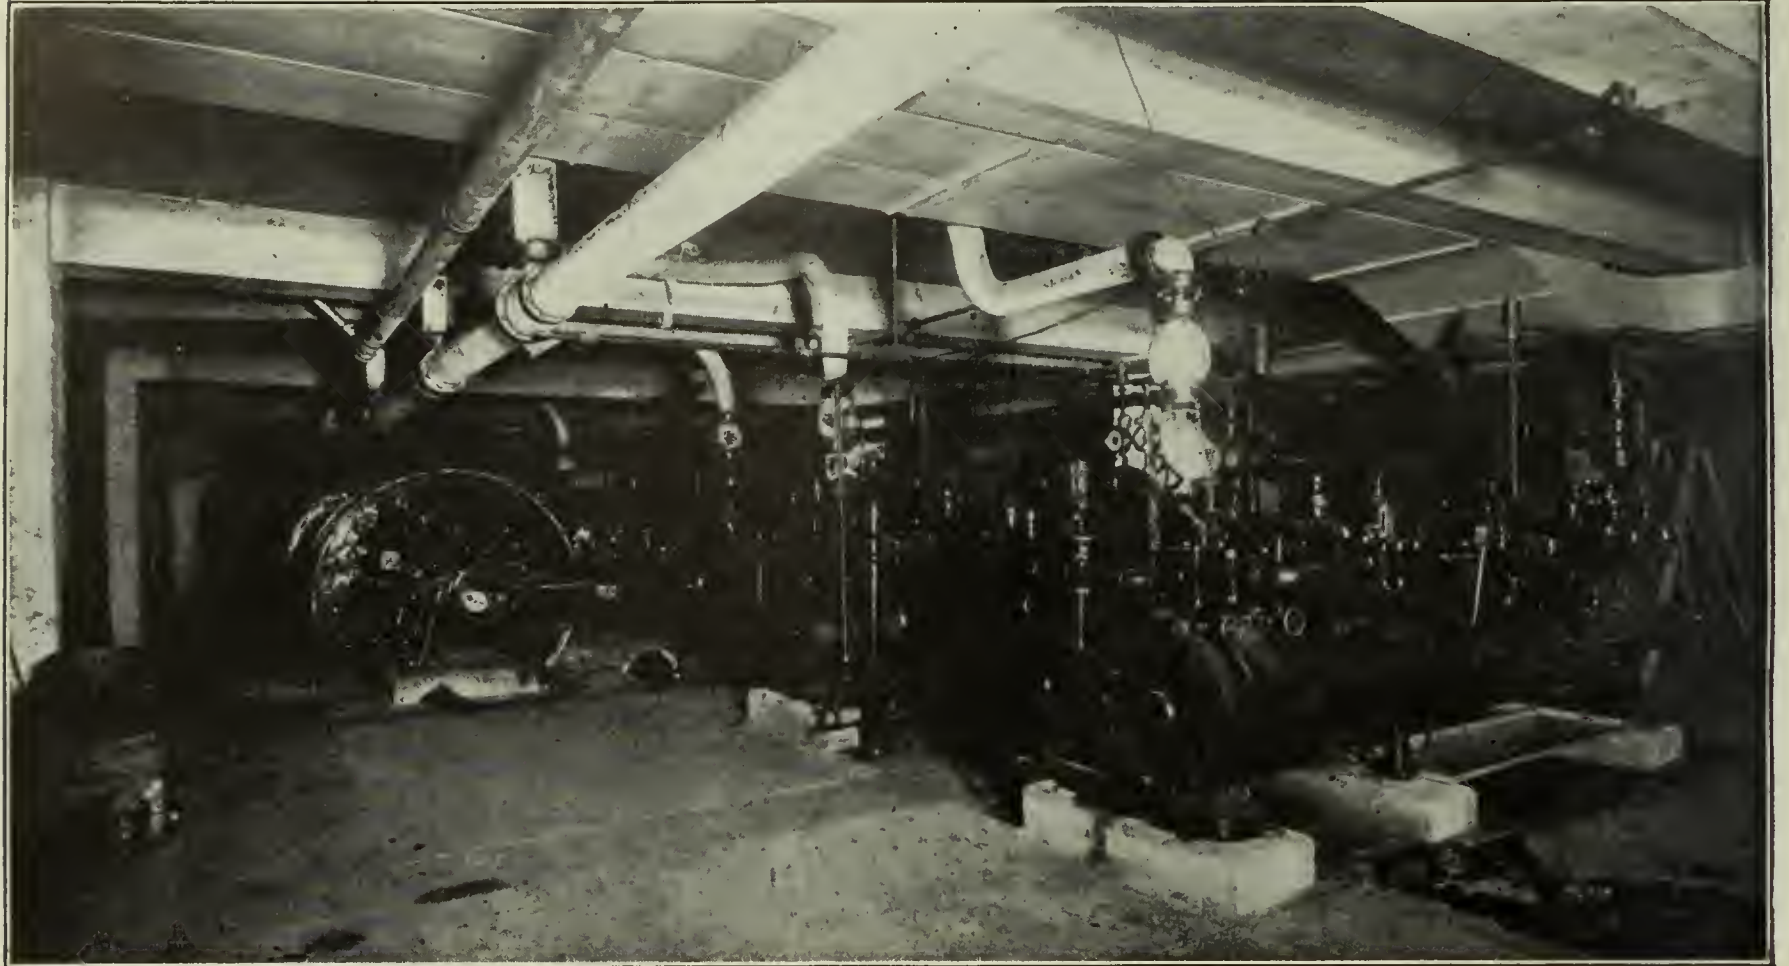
ELEVATOR PUMPS UNDER MADISON STREET END OF STATION
